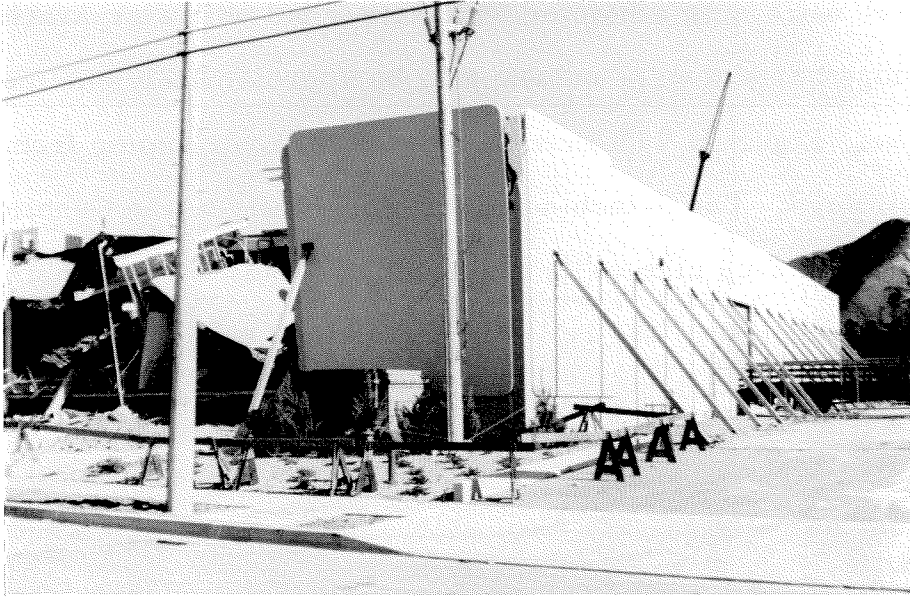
Collapsed section of tilt-up wall. Vector Electronics Building.
